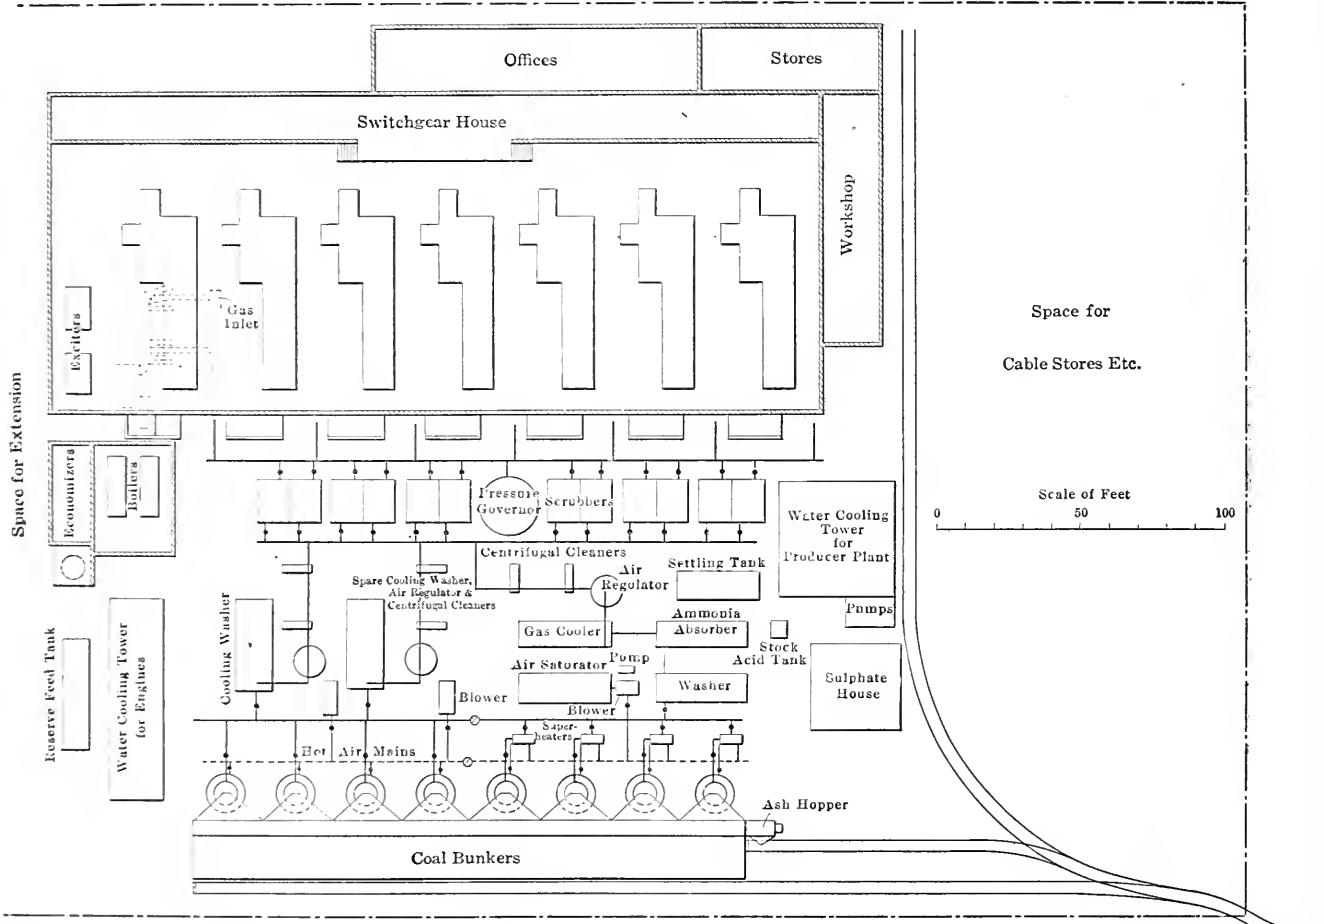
PLAN OF 10,000-KILOWATT GAS PLANT
